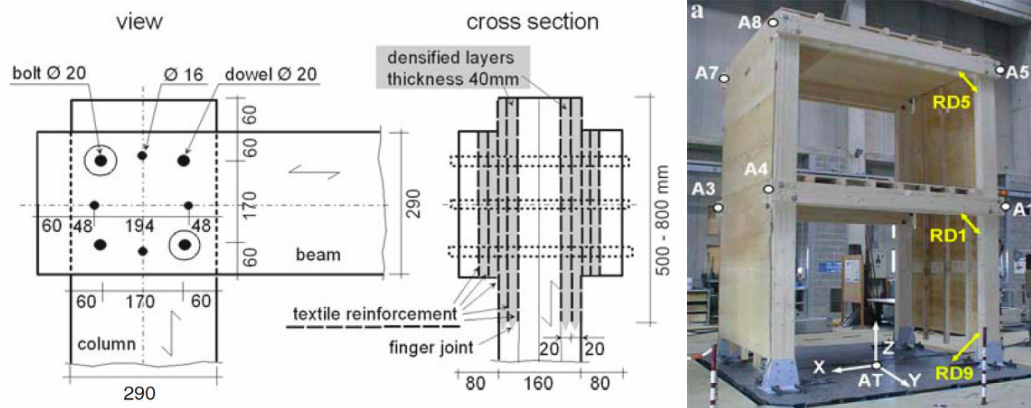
Pinned timber frame connection for two storey test frame of Heiduschke (2008)
